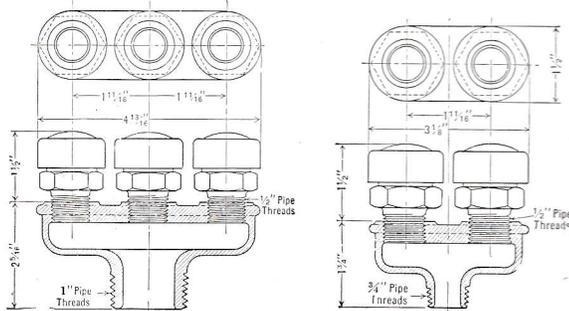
Dimensions of Multiple-unit Webster Vent Valves
